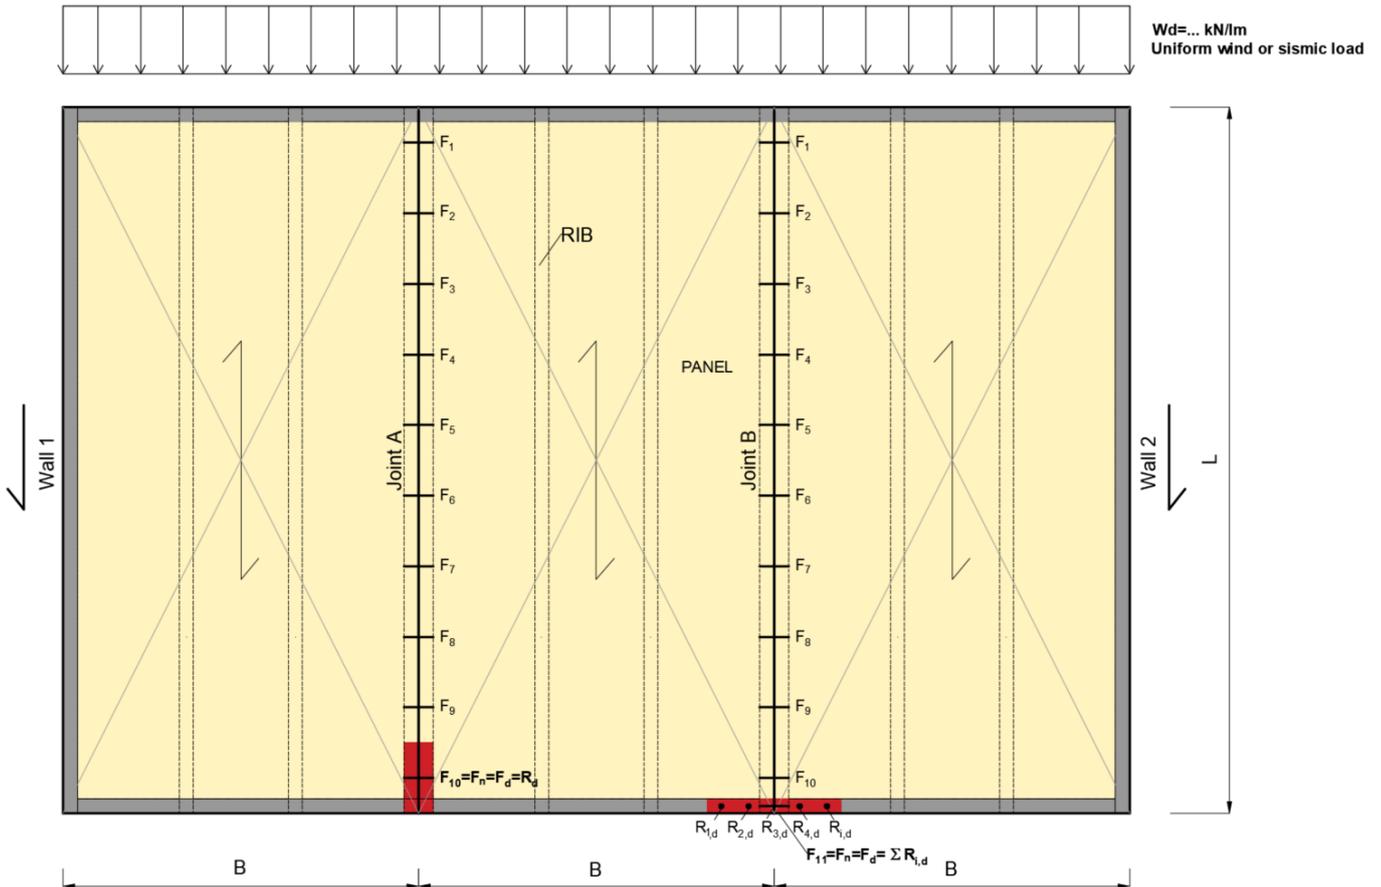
Fasteners placed in longitudinal joints and determination of the design carrying capacity of the outermost lying fastener  $F_d$  – Left (Joint A): Single fastener at the end; Right (Joint B): Multiple fasteners at the end.
